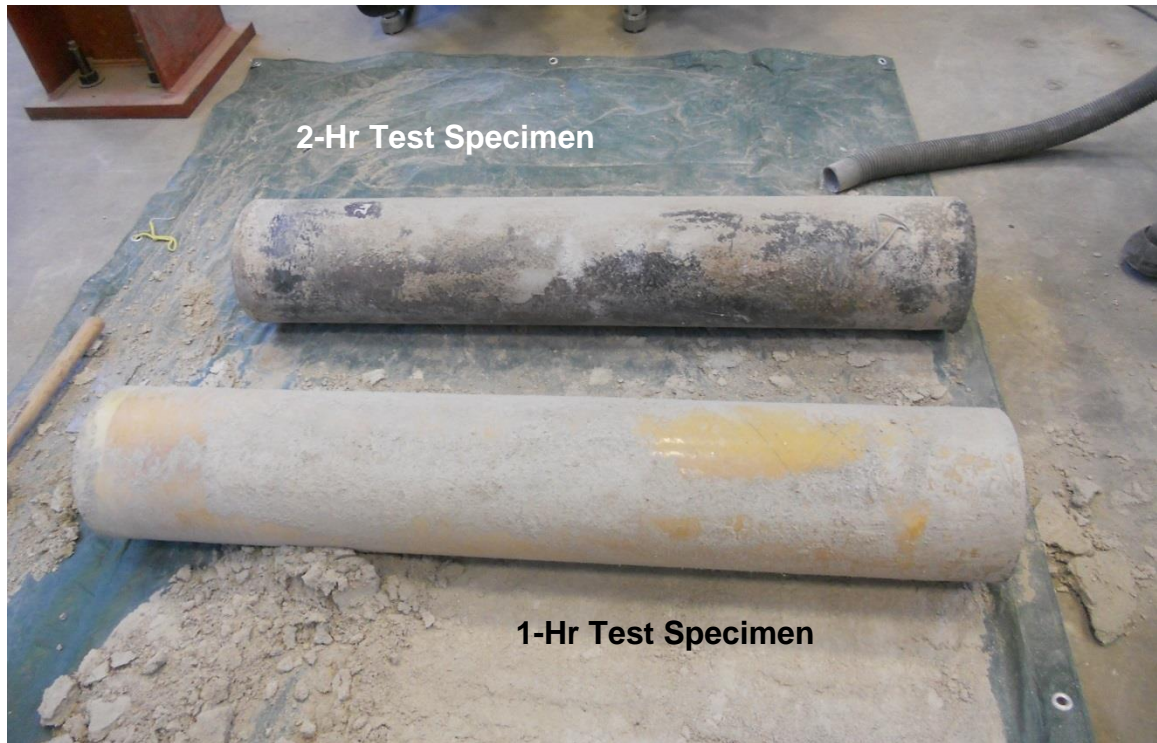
CFFT Columns after Extreme Fire Exposure
